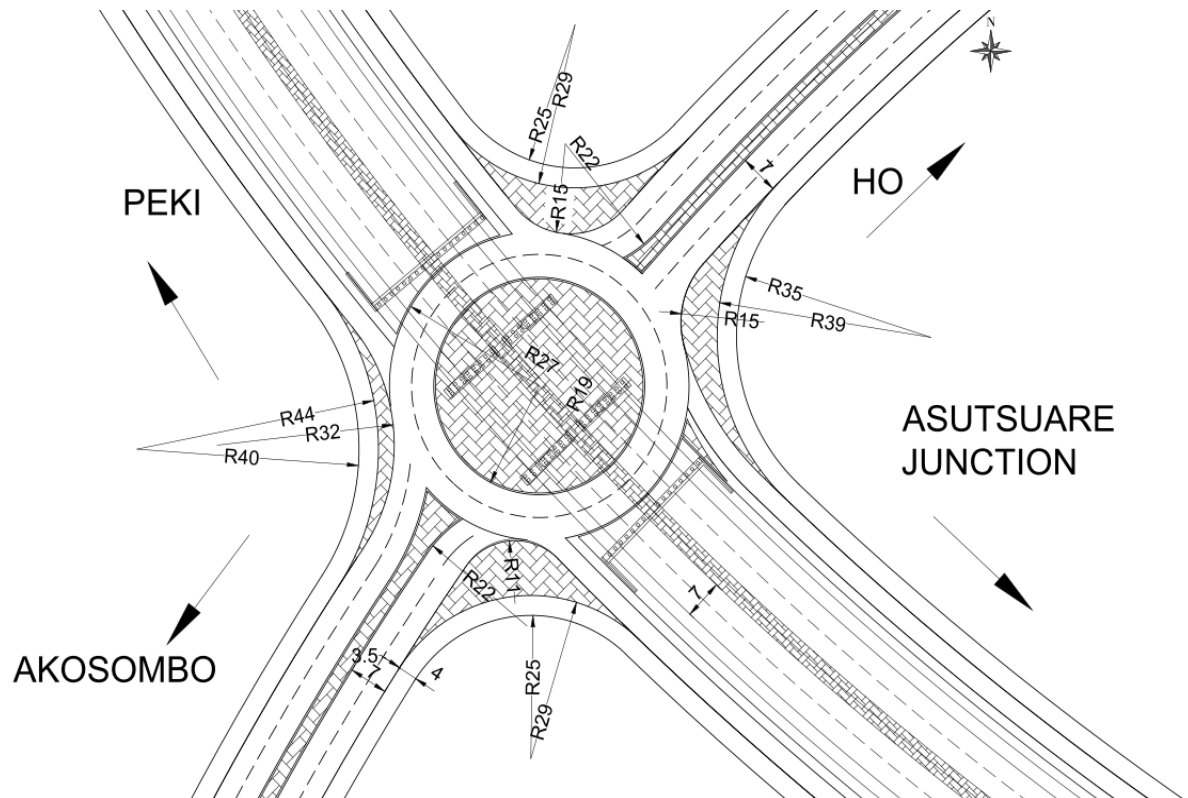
Layout of Asikuma Jn Interchange CH. 67+ 200 of Section 3 Project Road
